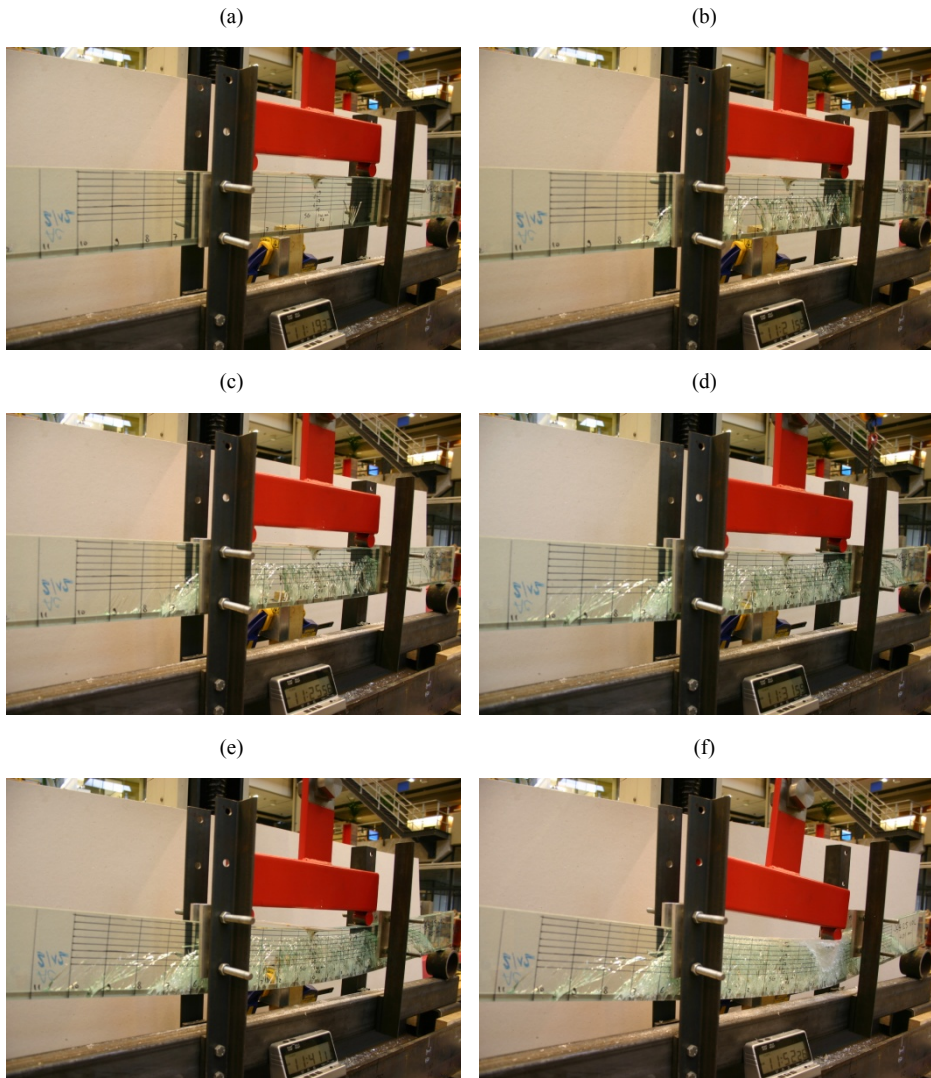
Photo sequence of an exemplary bending test on a 1.5 m SG-laminated reinforced glass beam, with full section reinforcement.
